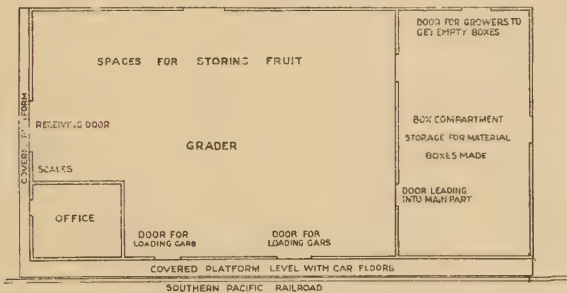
PLAN OF FRUIT PACKING HOUSE.
